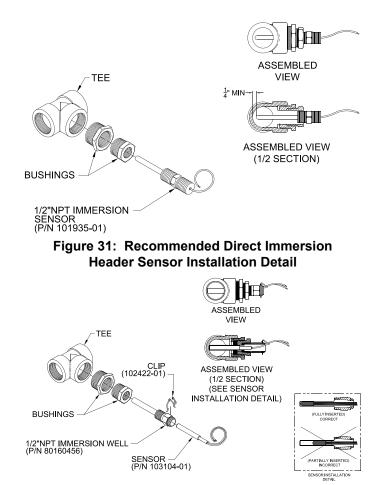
Alternate "Immersion" type Header Sensor Installation Detail
